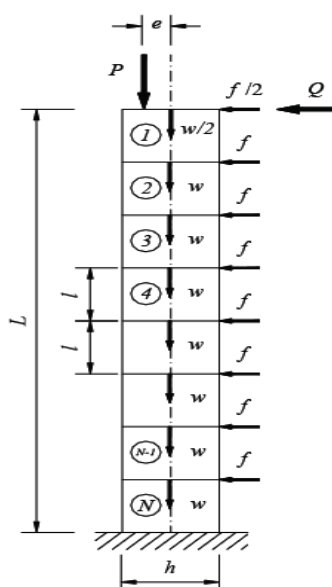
Idealized masonry wall (Schultz et al, 2009).
